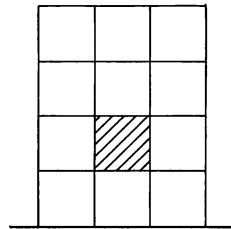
b Frame with a Panel Wall (Specimen-1)
